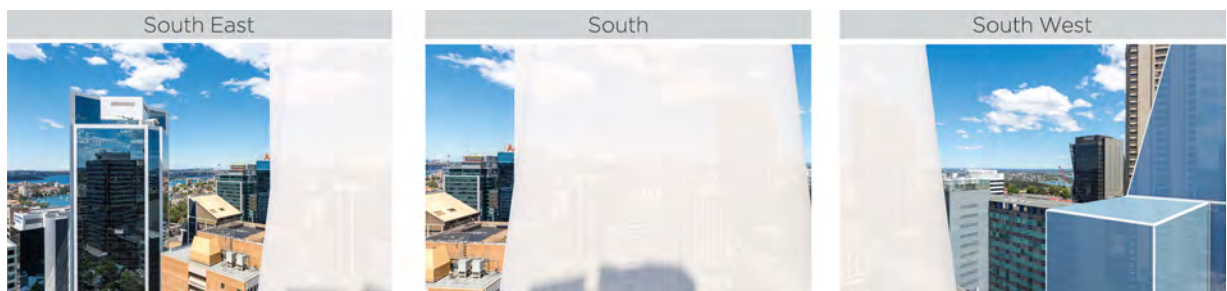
Level 20 view from Beau Monde (proposed envelope in blue)
